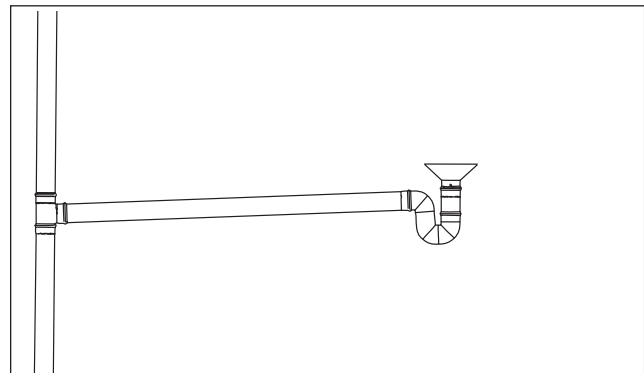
Non-ventilated pipes should be connected to vertical pipes with 87°-88° branch pipes and the side pipe should have the smallest possible fall.
